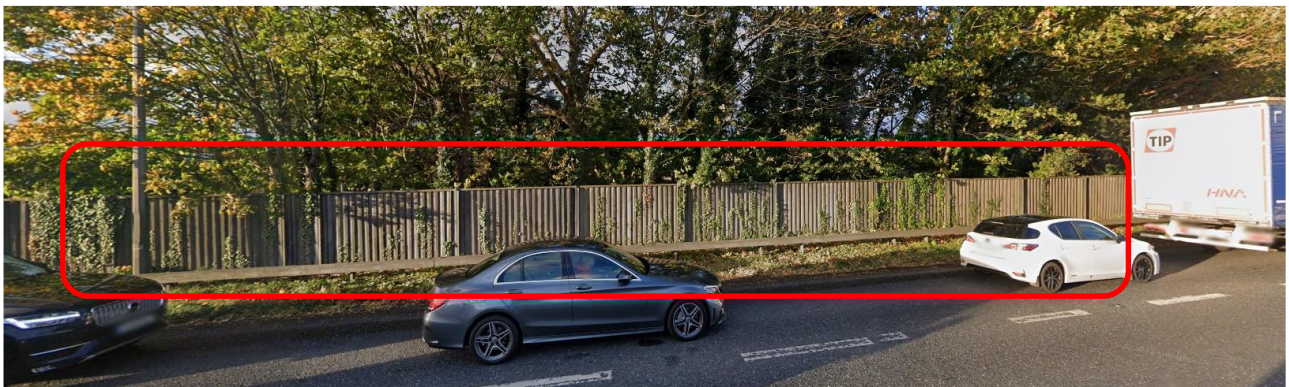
Existing Street View at 3 Herbert Road (Image Source: Google)
